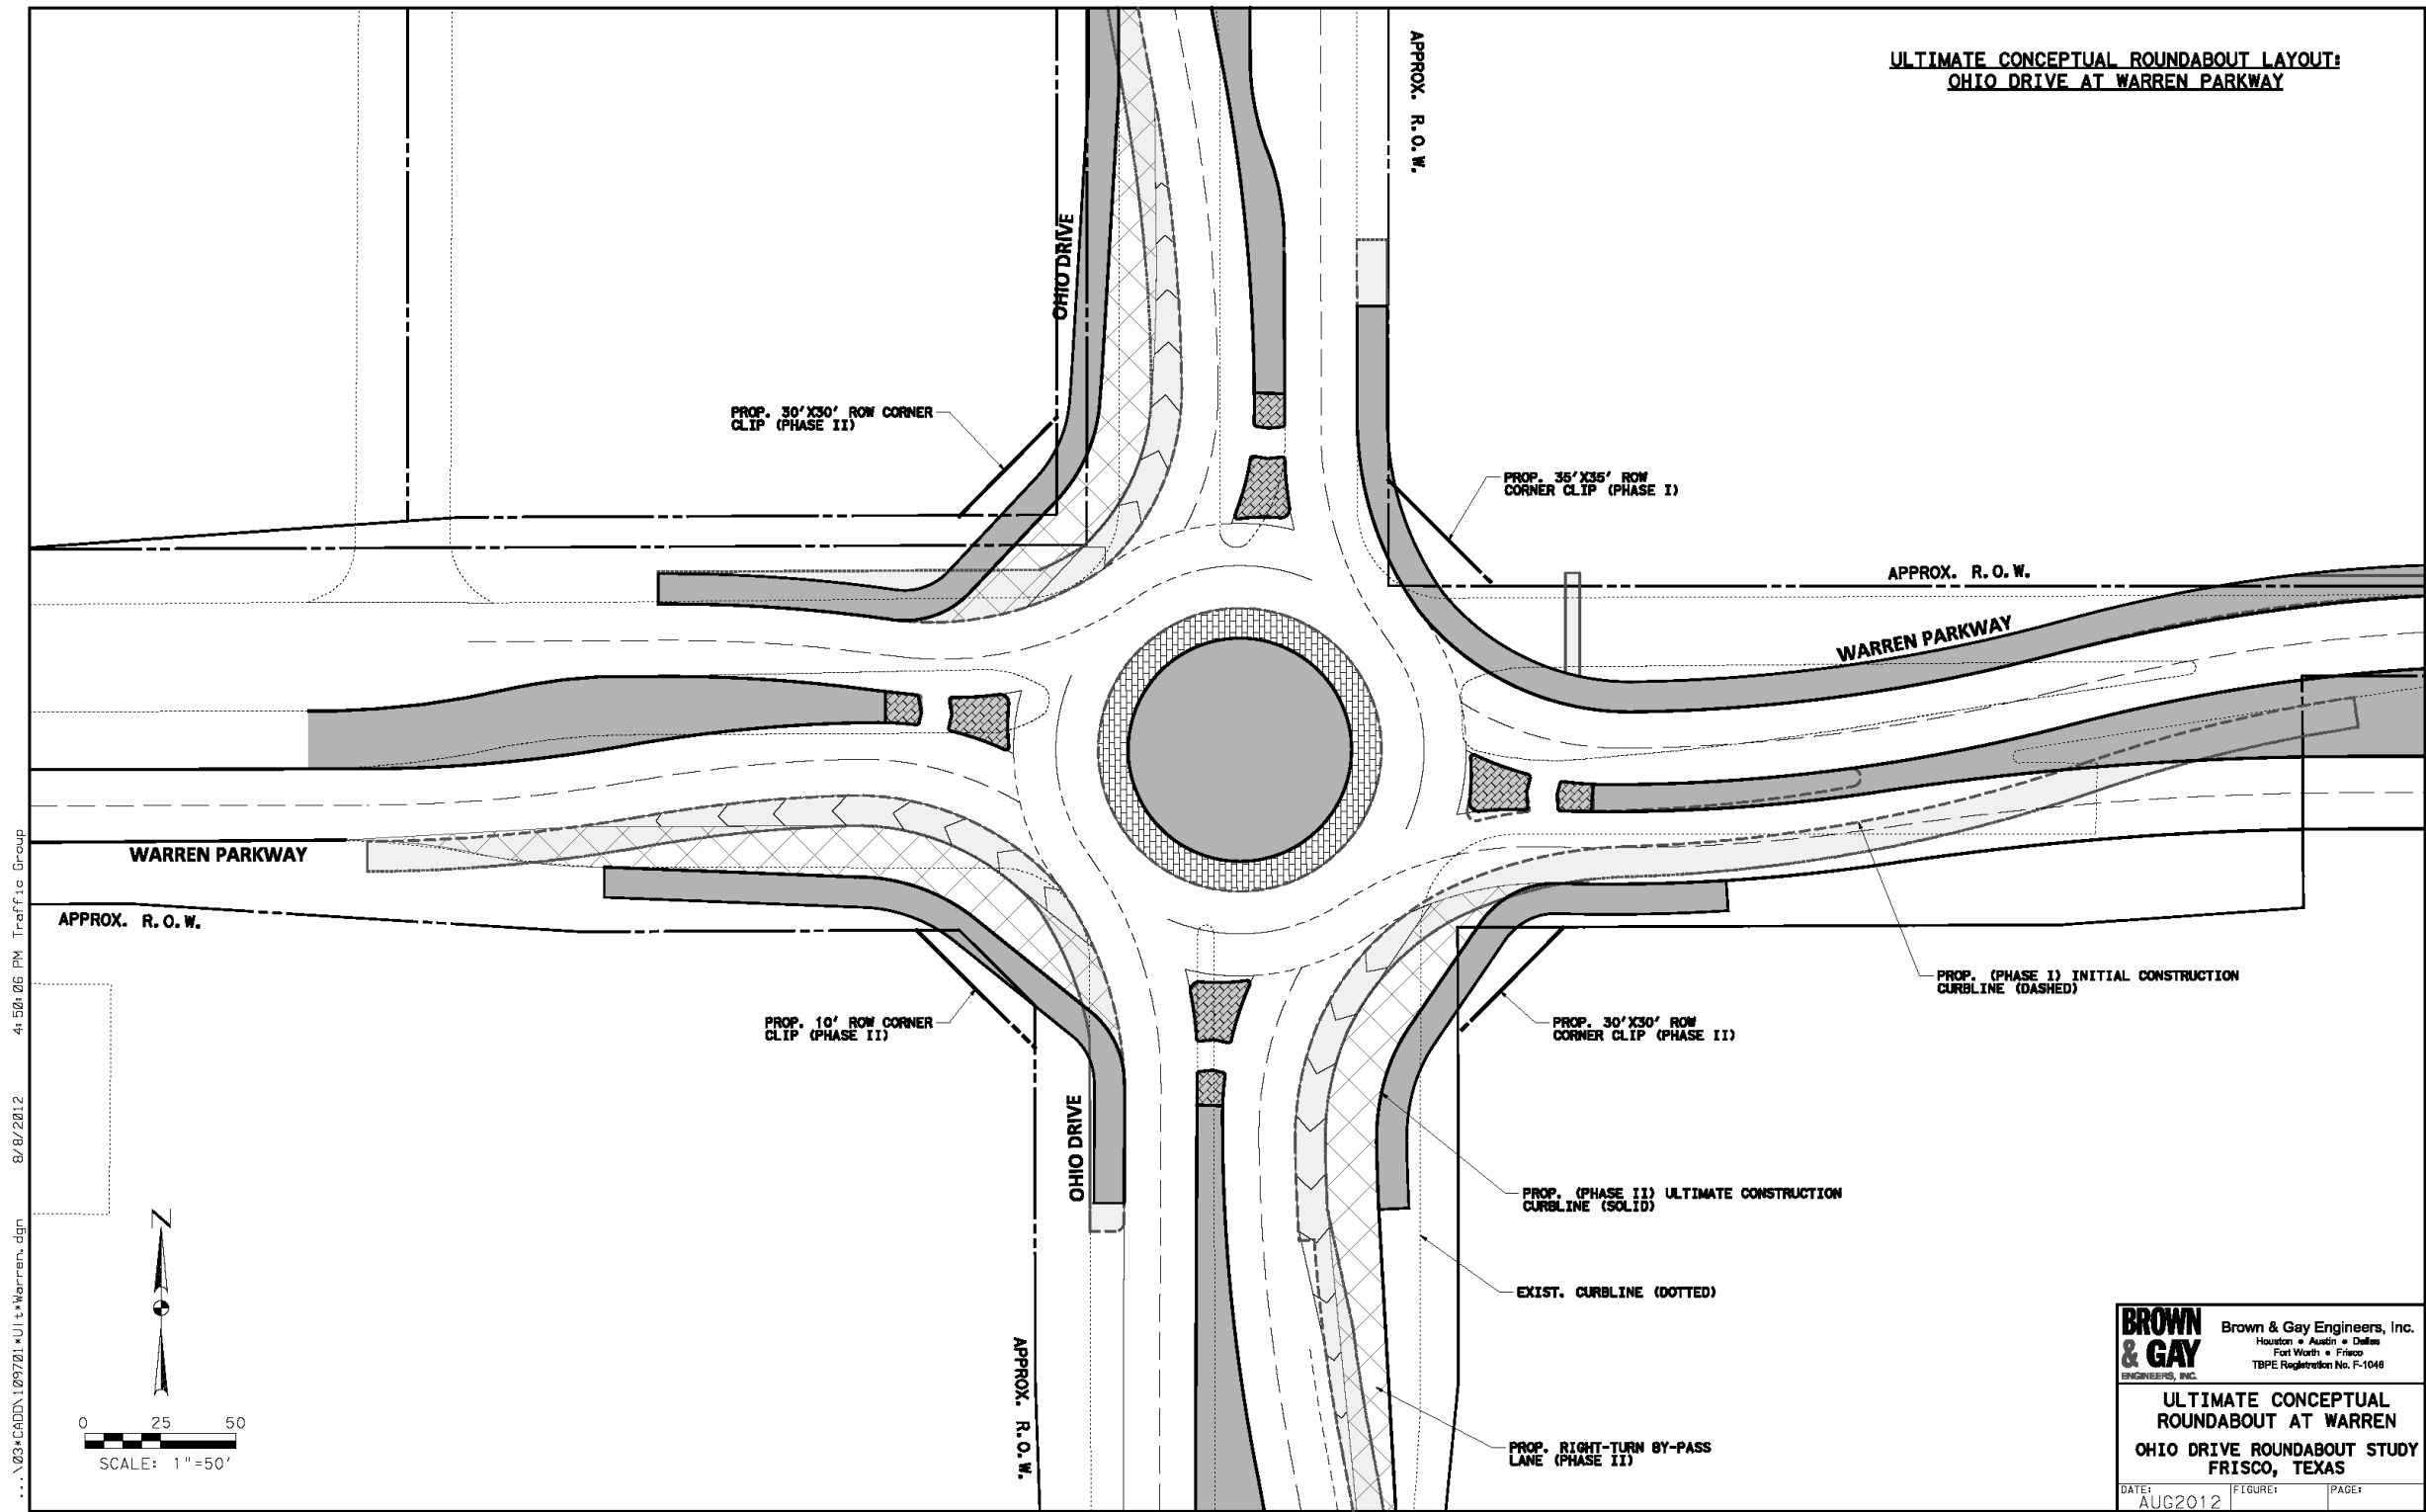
Proposed Ultimate Roundabout: Ohio Drive at Warren Parkway
